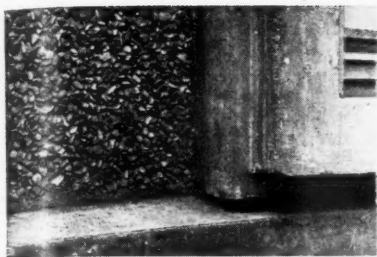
Detail of the precast units at the Paris flats. Architect: Denis Honegger
